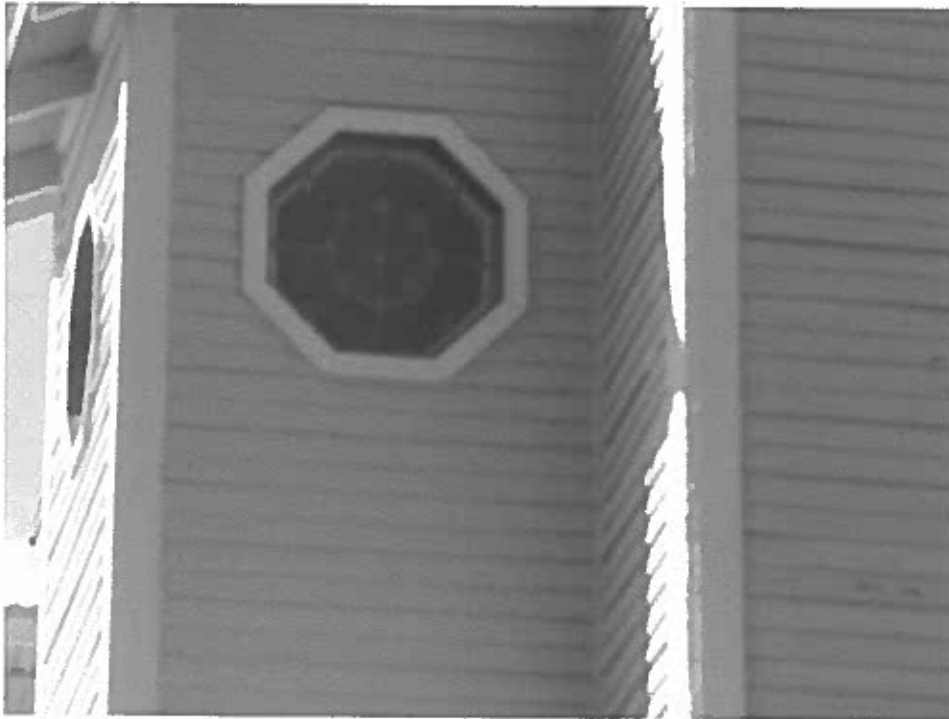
Shower/closet attached the south side of 2<sup>nd</sup> floor. View from the east.
